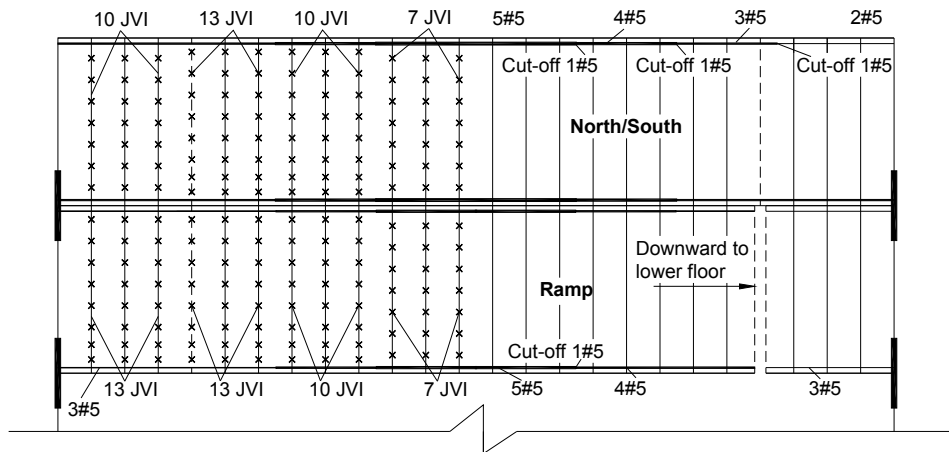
Diaphragm reinforcement at other floors for example 1C.
